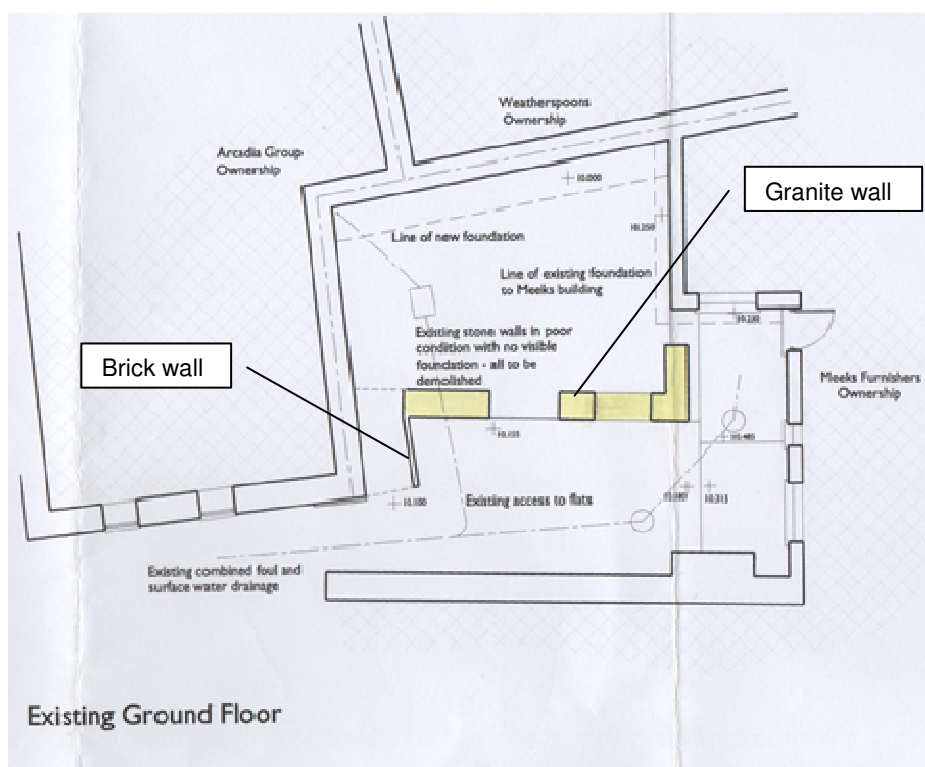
Site plan – existing (RLT Architects), with remnant historic wall highlighted
